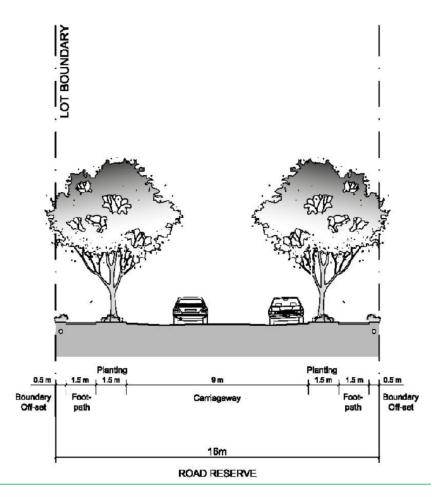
Typical local street when combined with a culvert of 5.5-9.0m in width.
